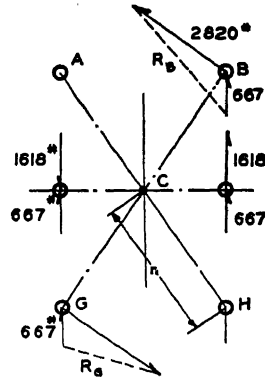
Analysis of Forces on Rivets of Eccentrically Loaded Bracket.
